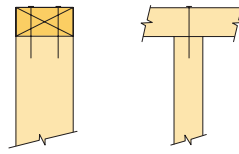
Floor joists layout criteria (see 7.1.2.2)
